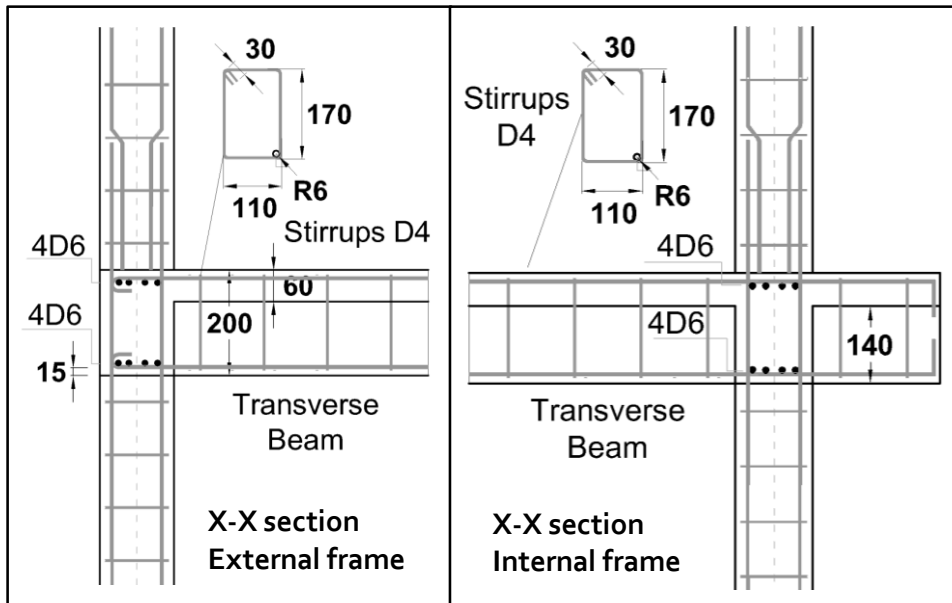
Exterior beam column joint details – transverse section – internal and external frames.
